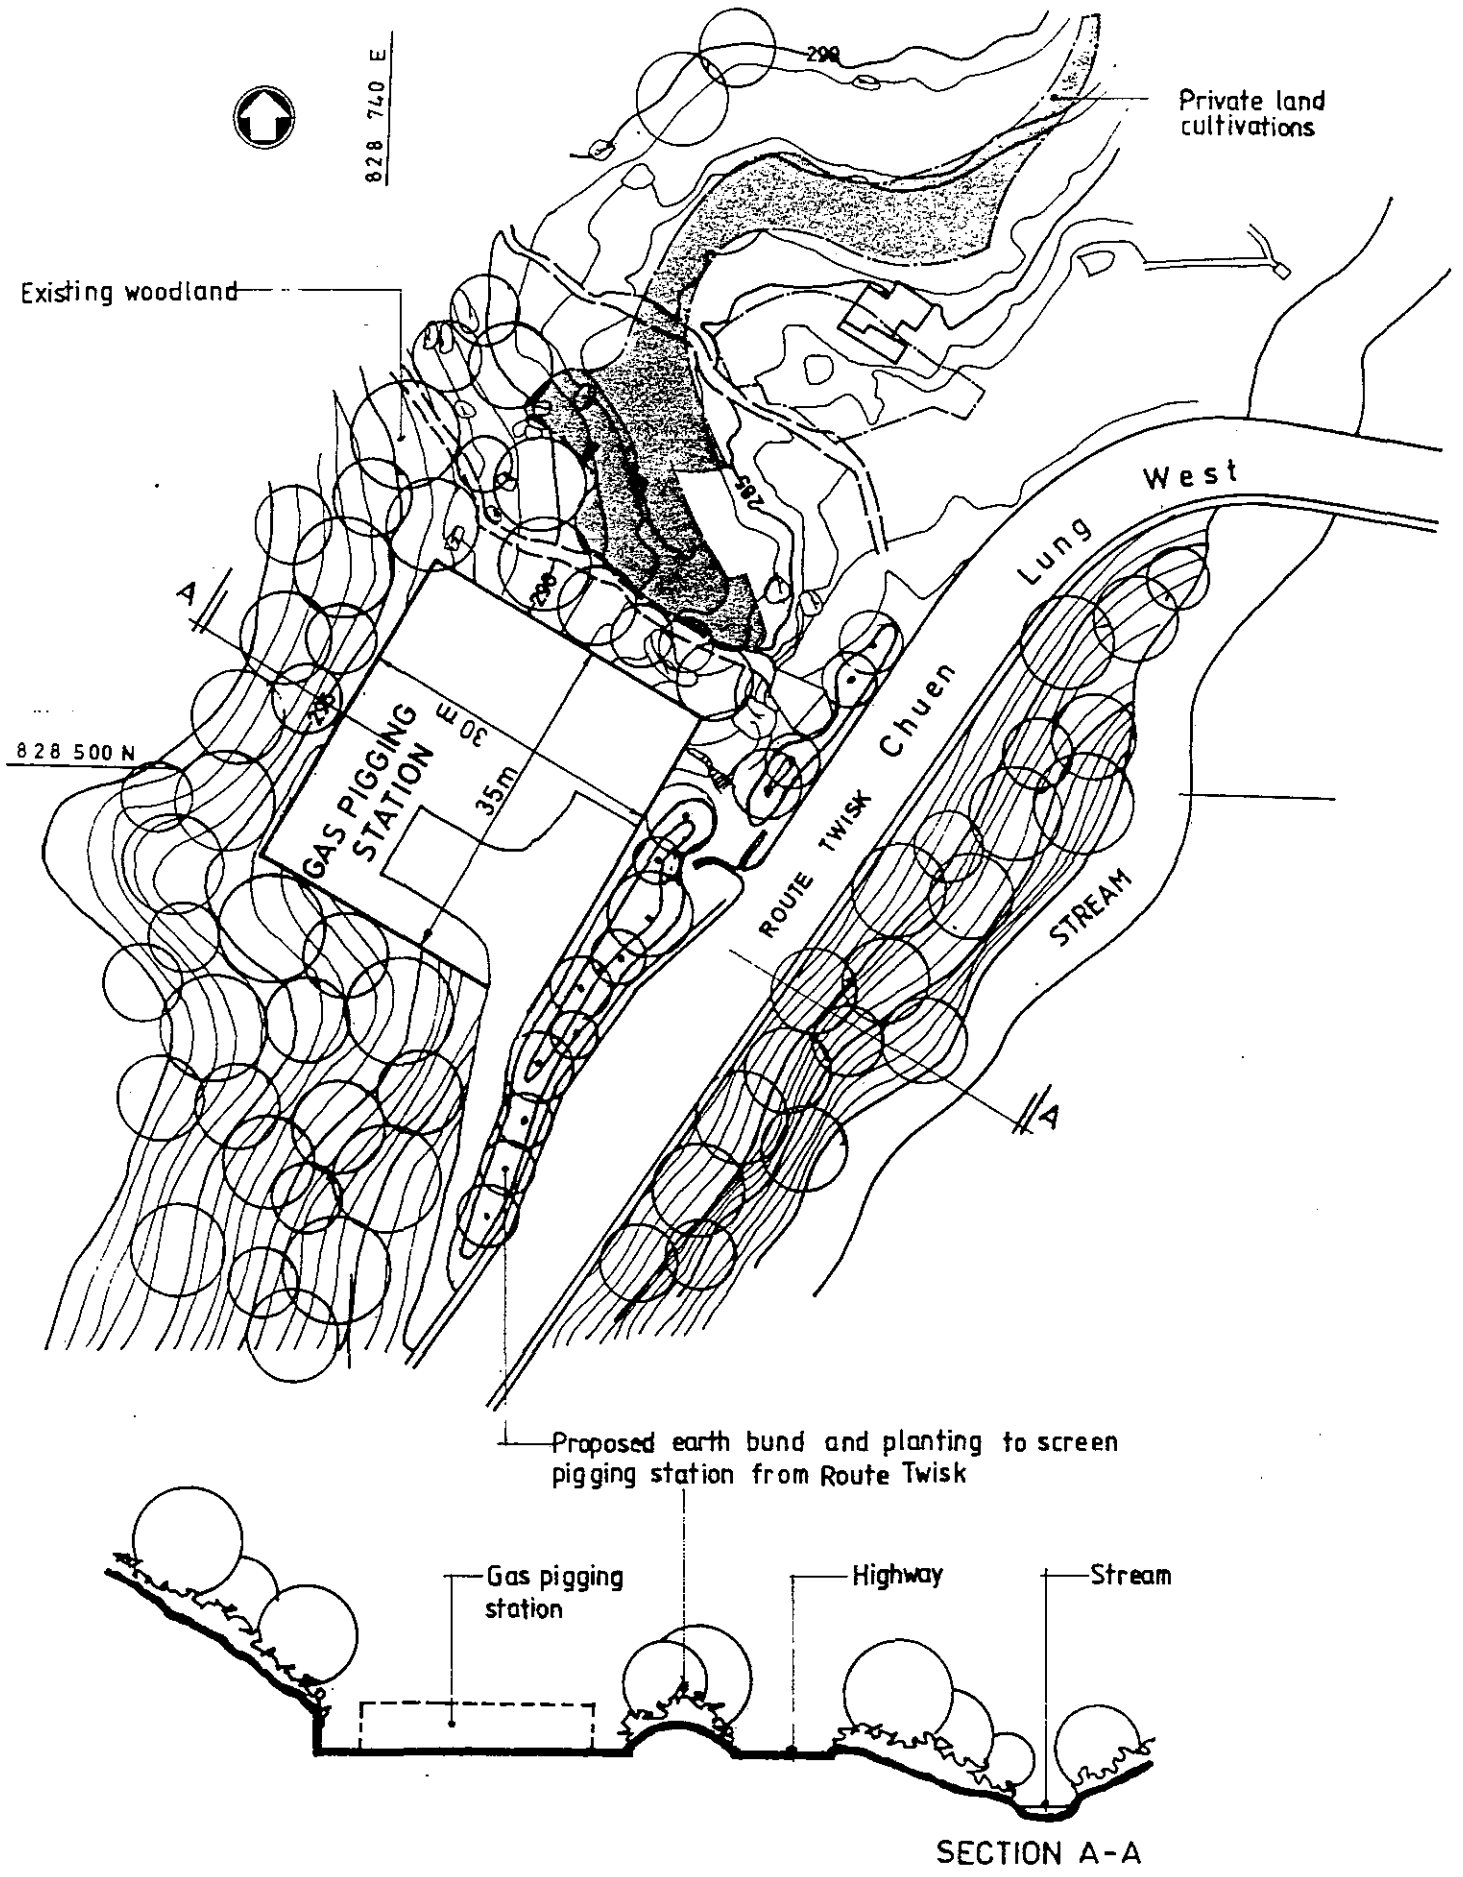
Proposed Screen Planting to Tuen Lung West Gas Piggling Station
